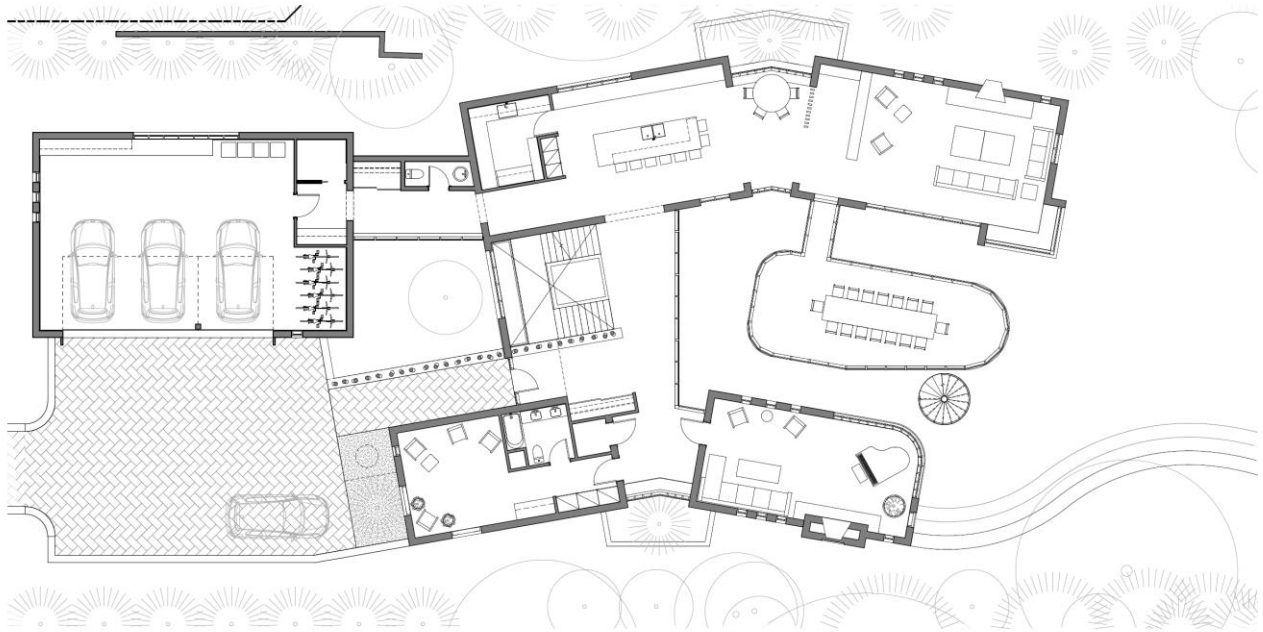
Revised ground floor plan. Source Linebox Studio 2022.
